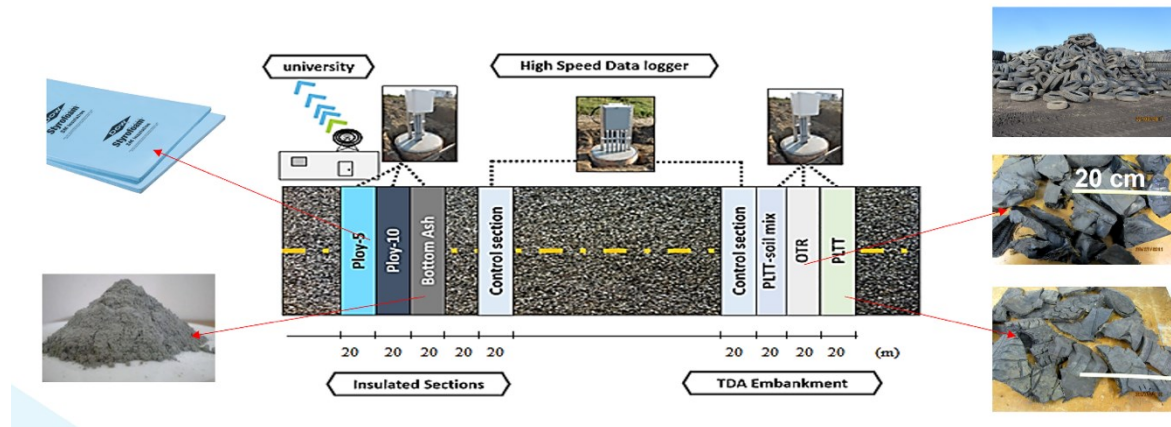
Test and control sections in the Integrated Road Research Facility test road
